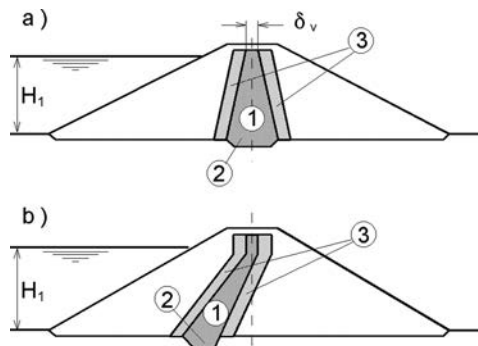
Earthfill dam with vertical (a) and sloping (b) core. (1) Core; (2) cutoff; (3) transition layers.
